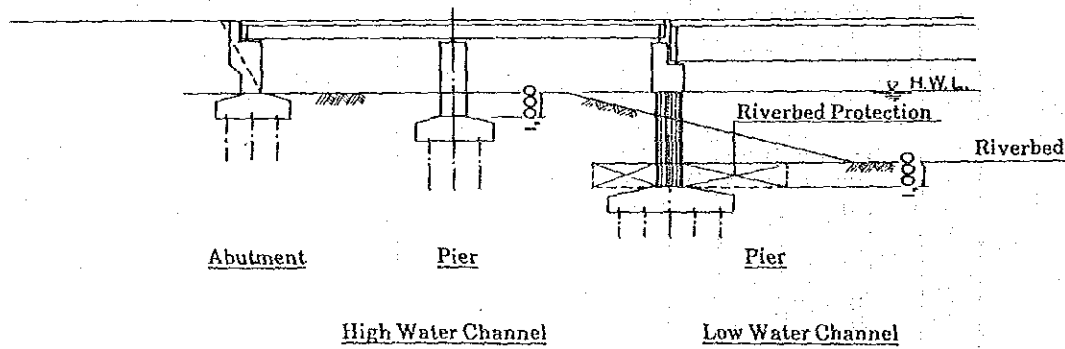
COVERING DEPTH ABOVE FOOTING
